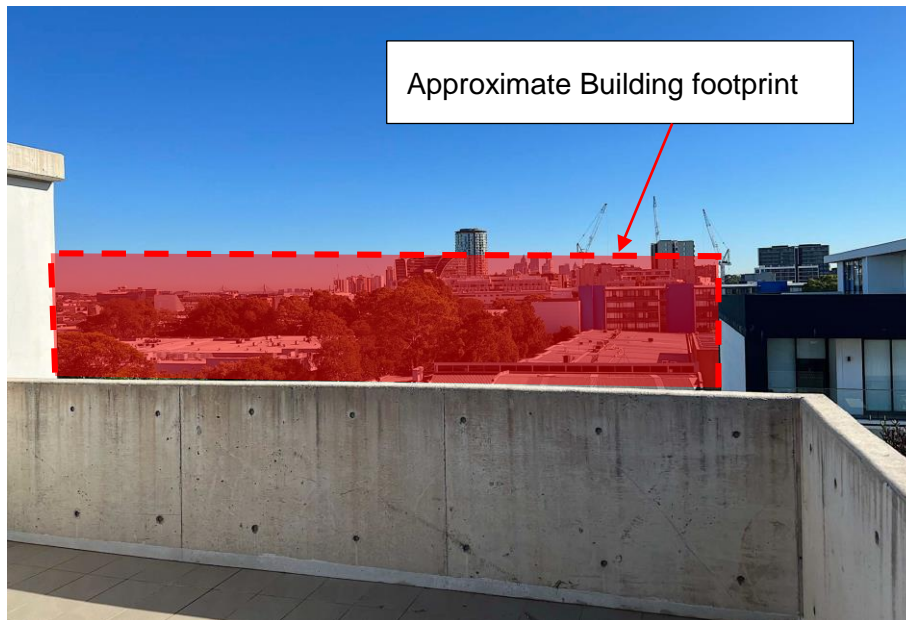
View from Level 6 - Roof top of adjacent residential building 29-31 Dunning Avenue (image provided by a submitter)
